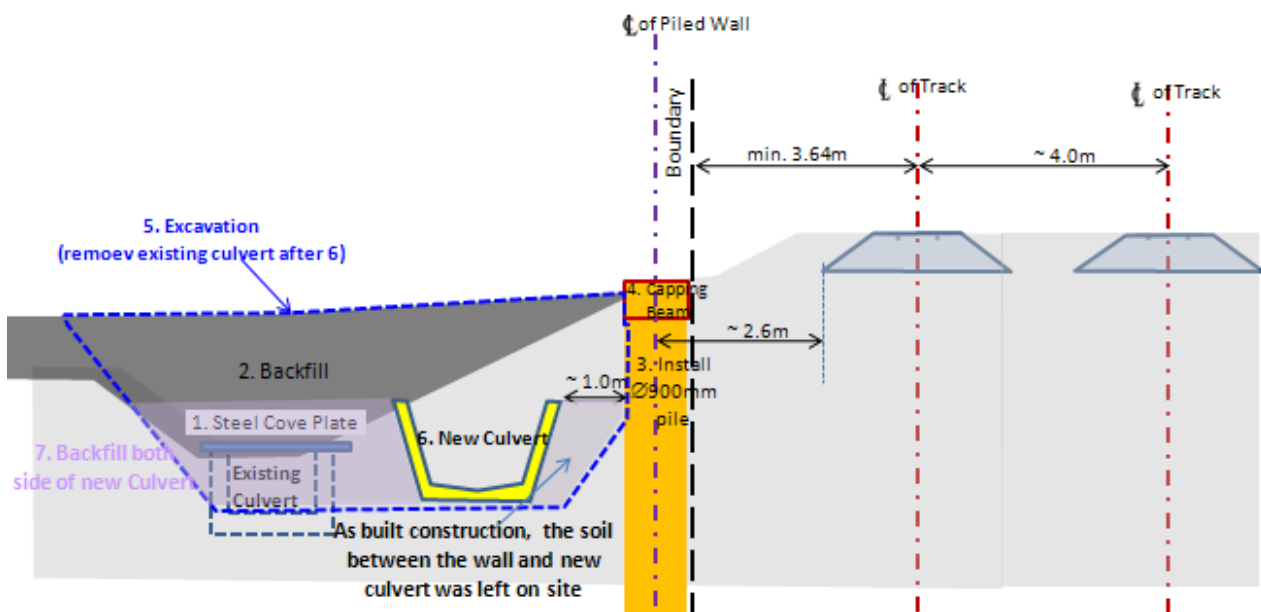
Proposed Construction Sequence (Typical Section of Ø900mm Contiguous Pile Wall)
